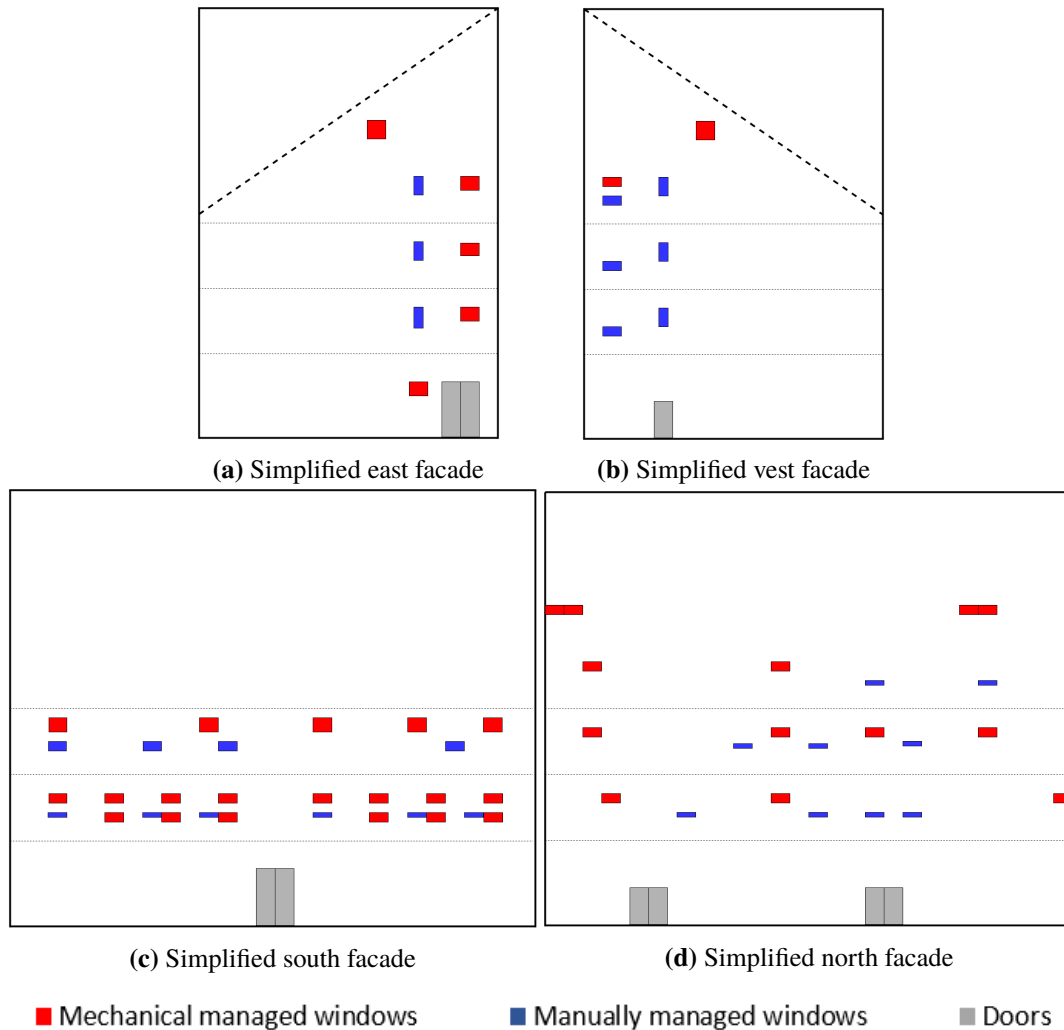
The facades of the building model of ZEB Laboratory with openable windows and doors implemented in the building model.
